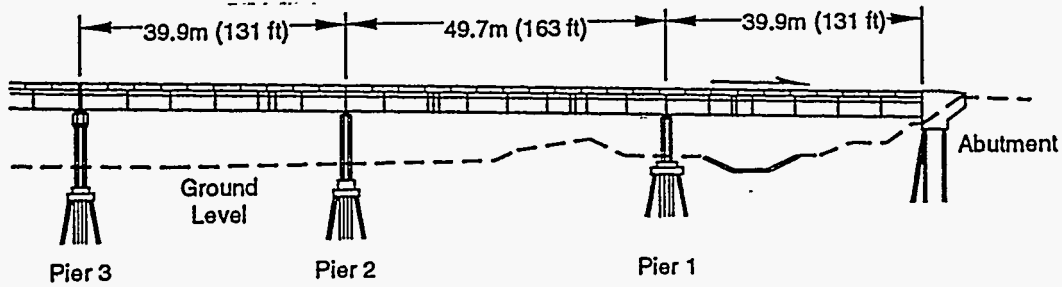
Elevation view of the portion of the eastbound bridge that was tested.
